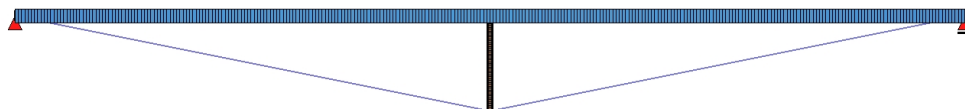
2-Dimensional numerical model of the smart under-deck cable-stayed footbridge.
